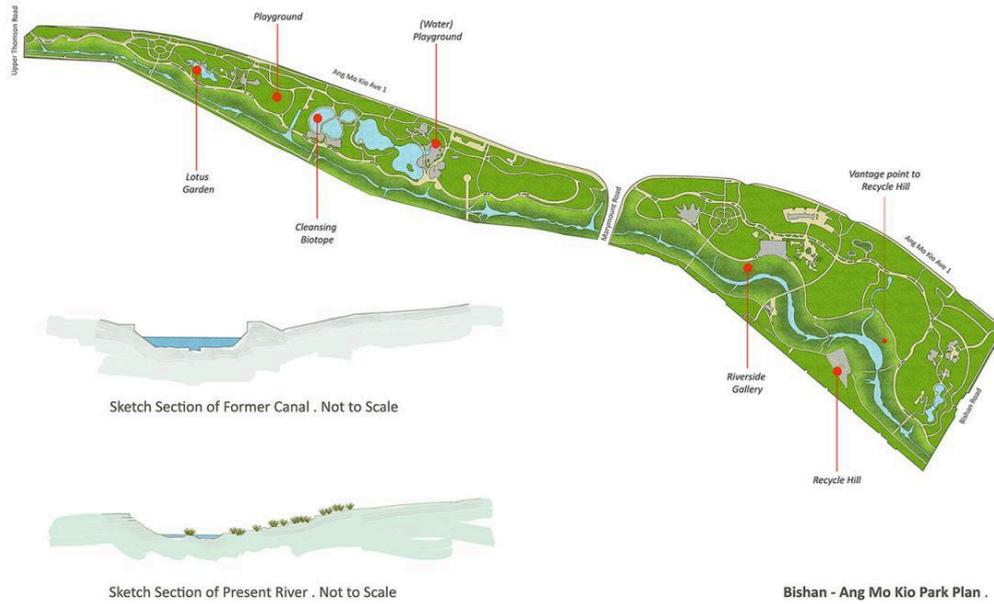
Sketch Plan & Section of Bishan - Ang Mo Kio Park (Source:Atelier Dreiseitl)
